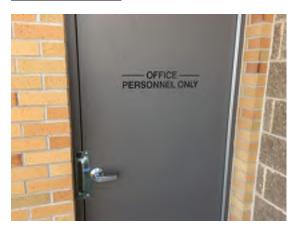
Maintenance door at 2012 addition. Keyed entry.
